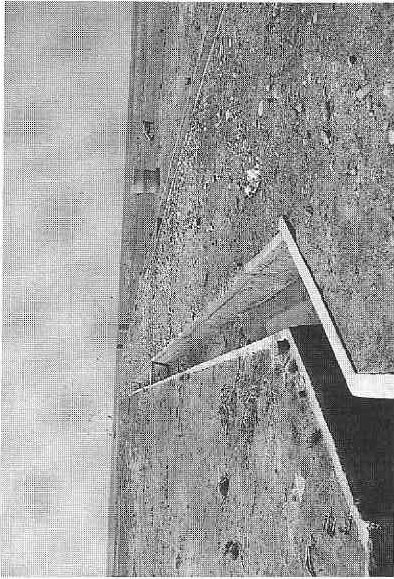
NHA Project Area, to the north of Barangay Narvacan
